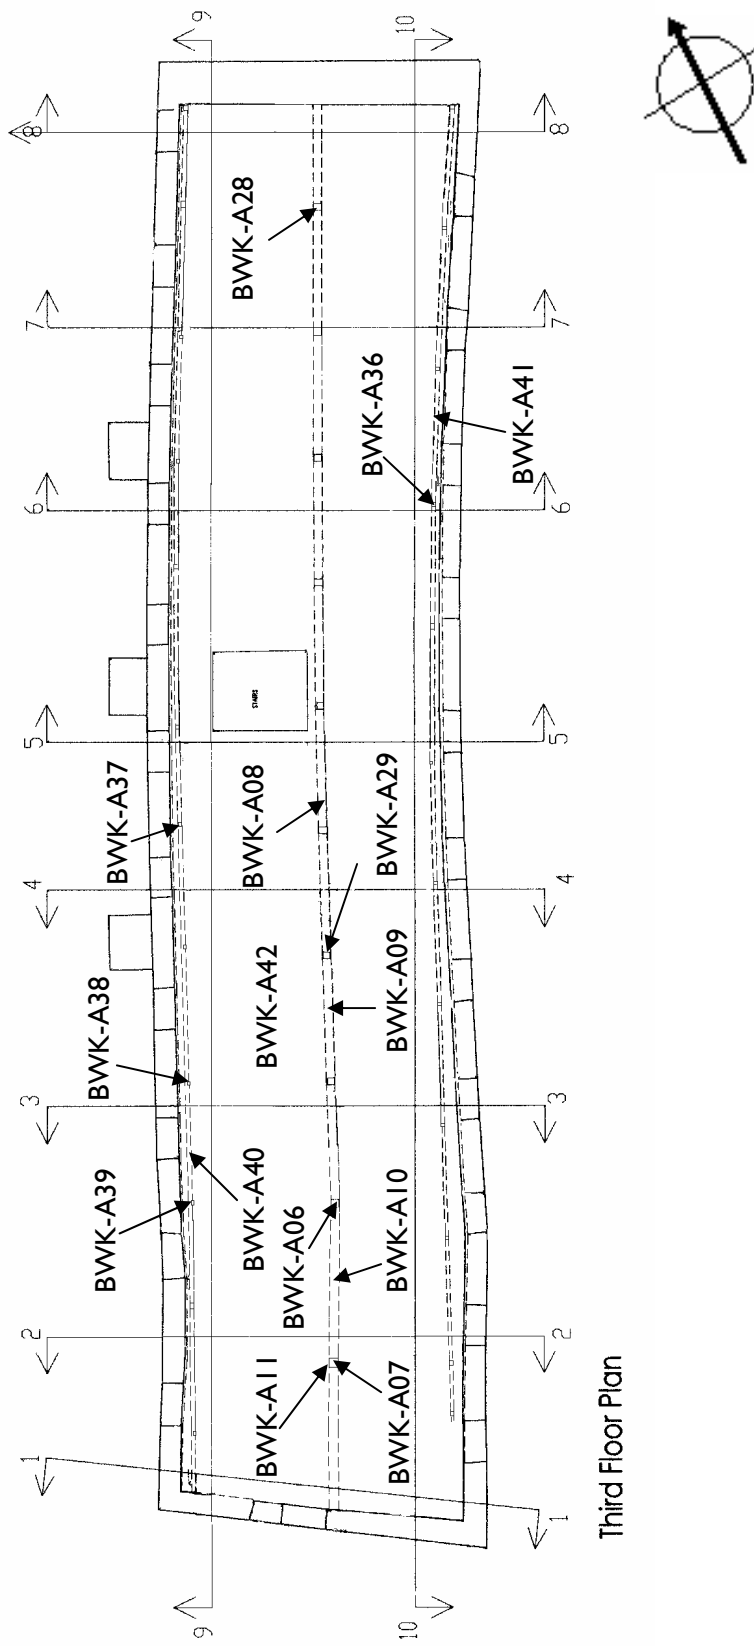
Third-floor plan showing the location of samples BWK-A06-11, BWK-A28-9, and BWK-A36-42 (Bain, Swan Architects)
